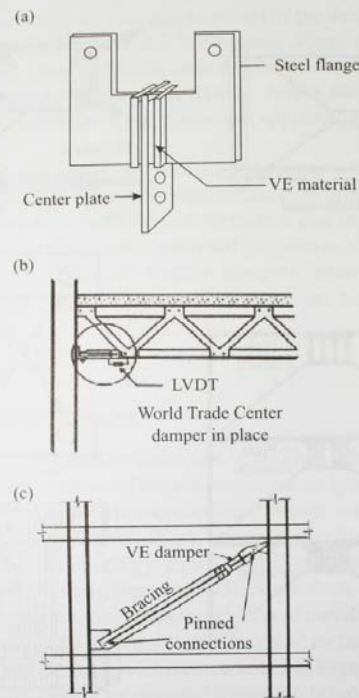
Viscoelastic (VE) damper: (a) damper detail, (b) installation as chord, and (c) installation as diagonal bracing.
